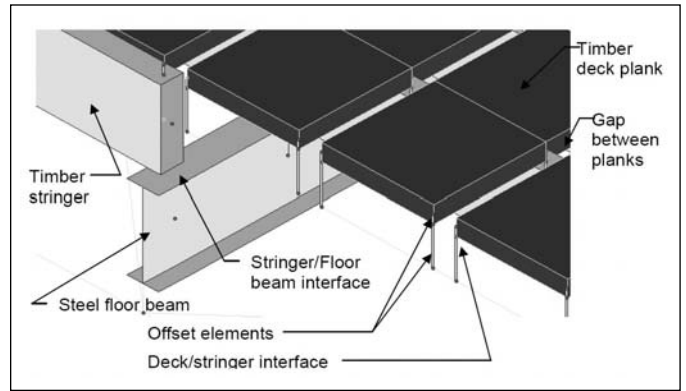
Computer-generated rendering of the timber deck planks on timber stringers on steel floor beams, including offset elements. There is a rotational release at the location of the deck/stringer interface. This model is for the Fruita Bridge deck, so gaps are present between the rows of plate elements.
